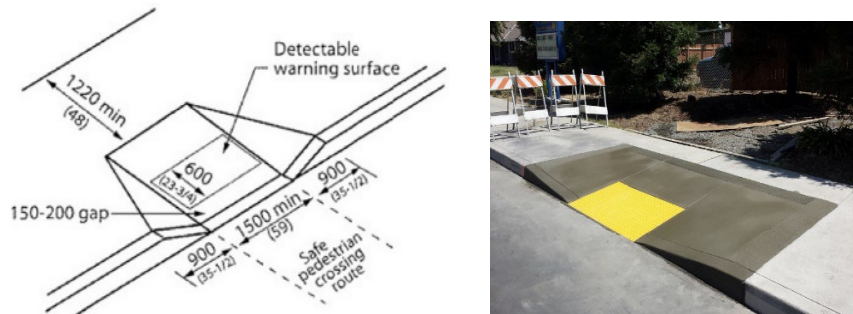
(From left to right) Facility Accessibility Design Standards on curb ramps; Example of curb ramp
